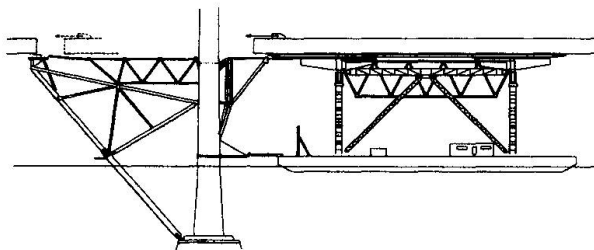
The catamaran in position for hauling in a special tower section.
